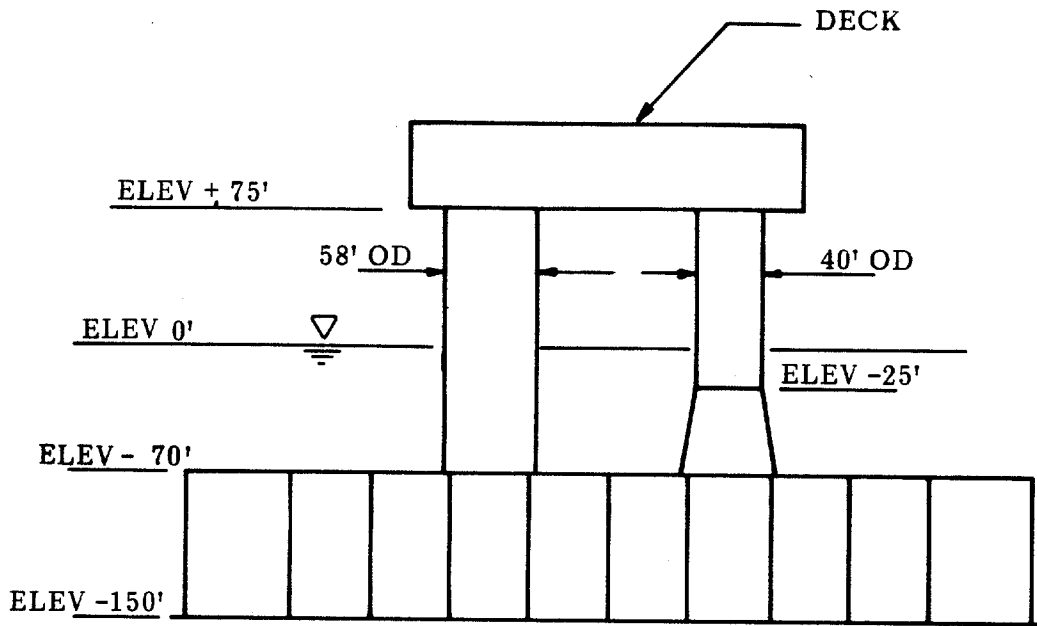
CONCRETE GRAVITY PLATFORM, 150 FT WATER DEPTH
